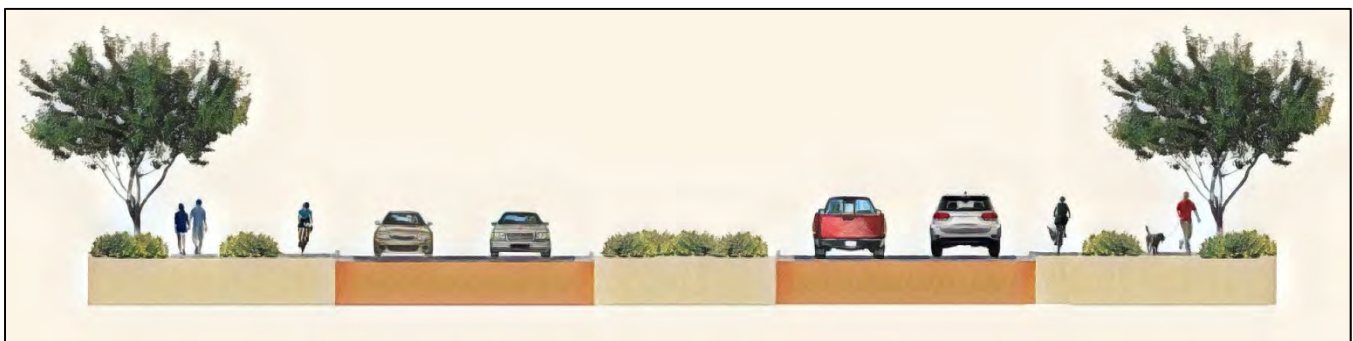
Arterial Street Cross Section (120 foot ROW)
